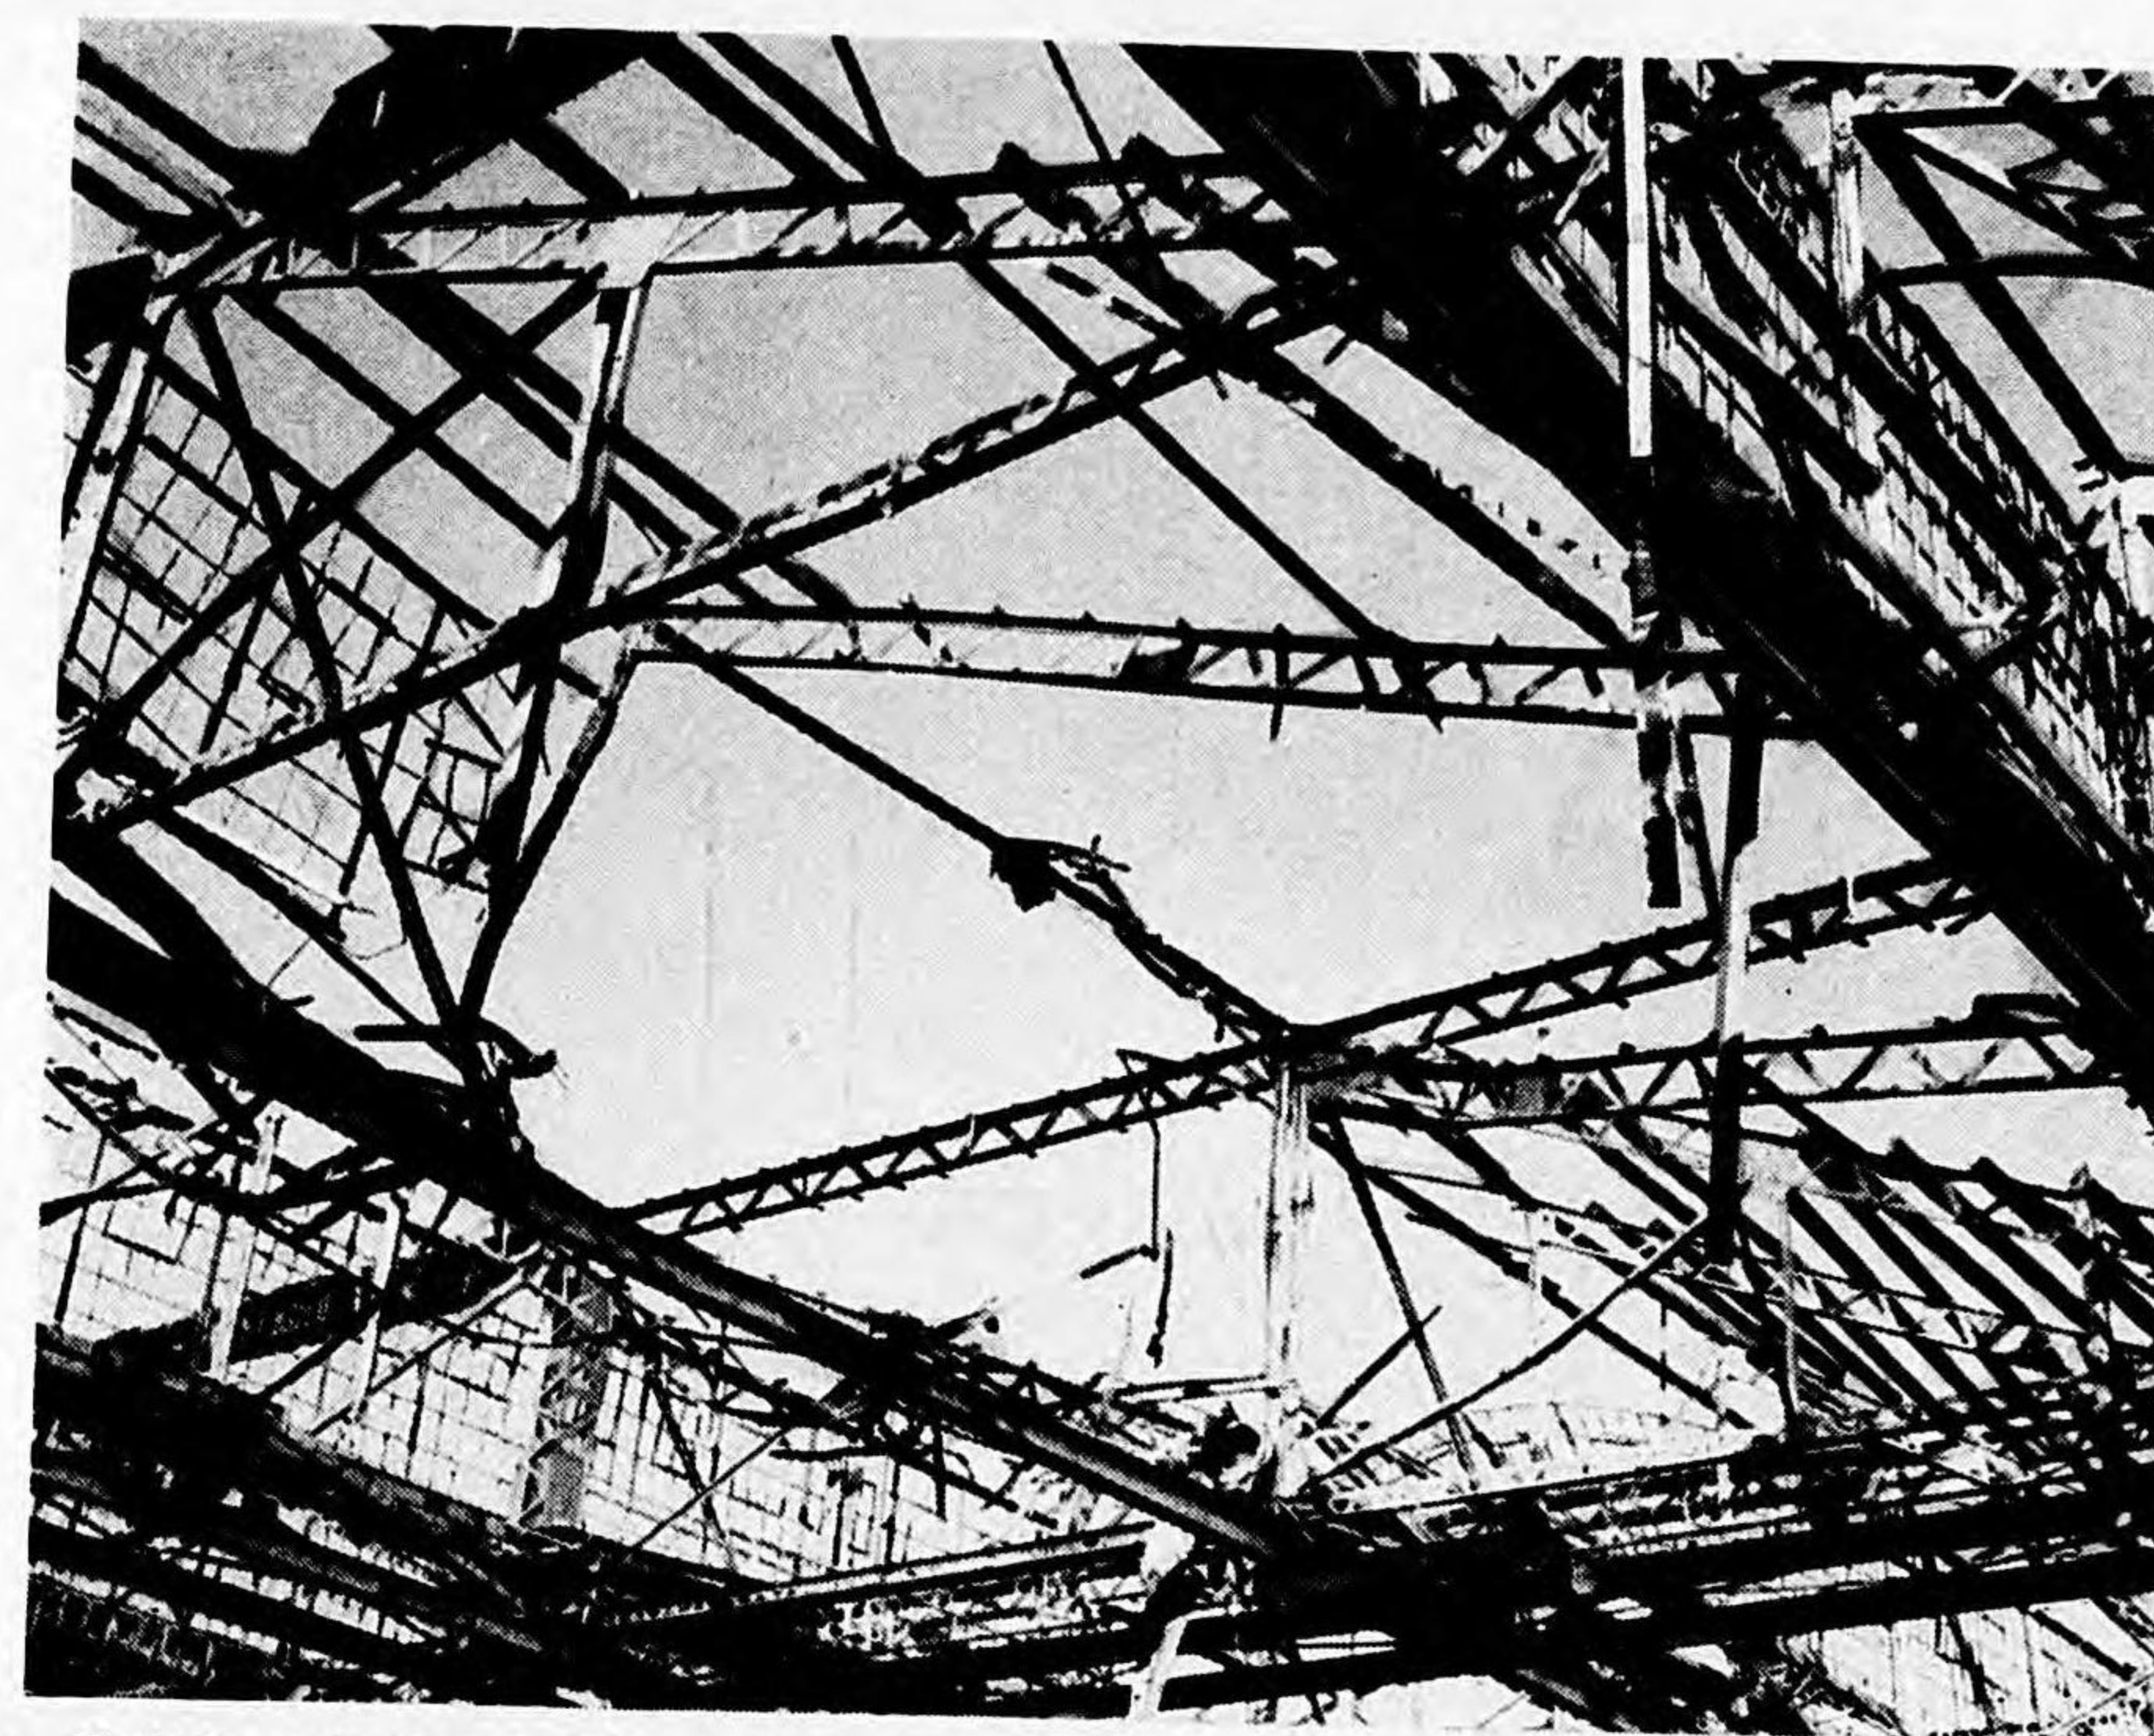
Building 3, Bomb 12; roof steel damaged; horizontal members intact. (Image reversed).
